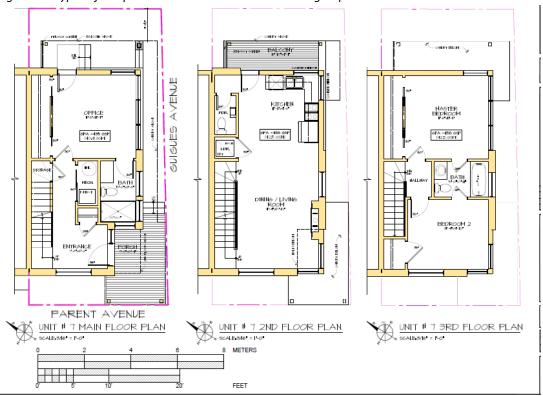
Typical floor plans Unit 7. Source: Hamel Design August, 2019.
